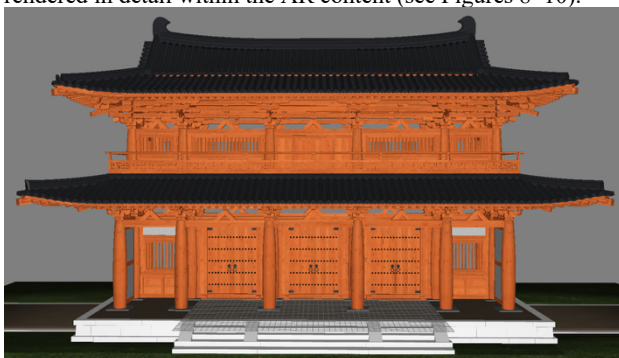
Initial AR Model: Wall not applied, wide balustrade spacing.
